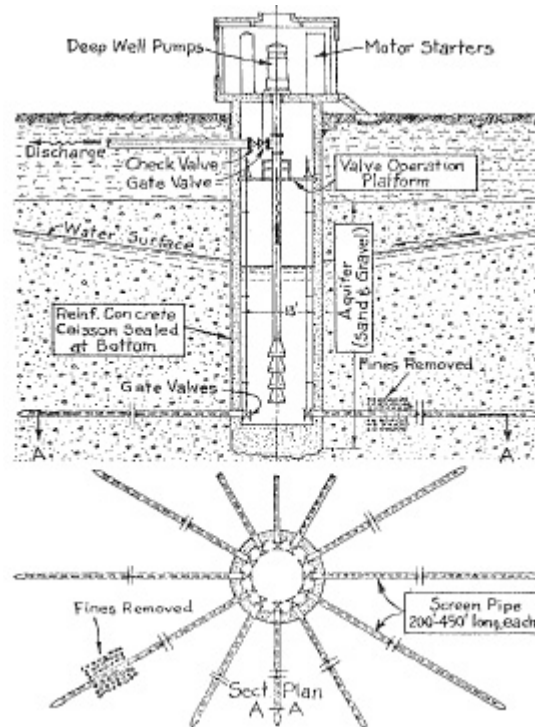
Radial Well – Section and Plan Views [Ref. 6.2]
